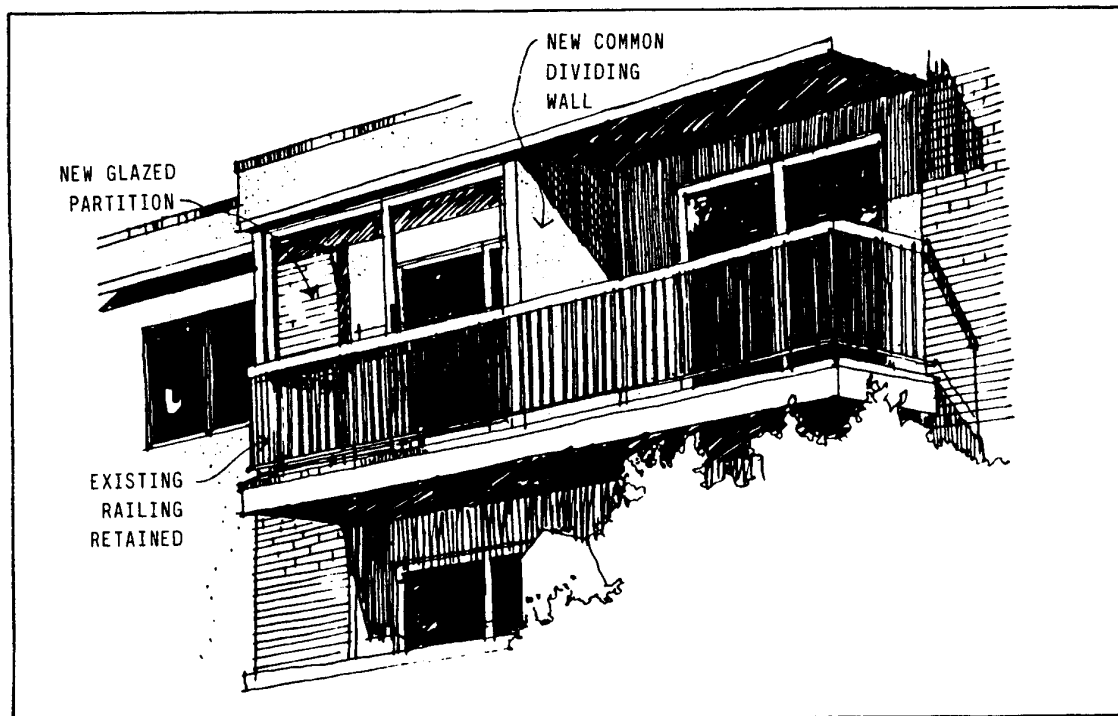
Example of Low-Rise Balcony Enclosure Retaining Existing Balcony and Providing Dividing Wall to Neighbouring Open Balcony
